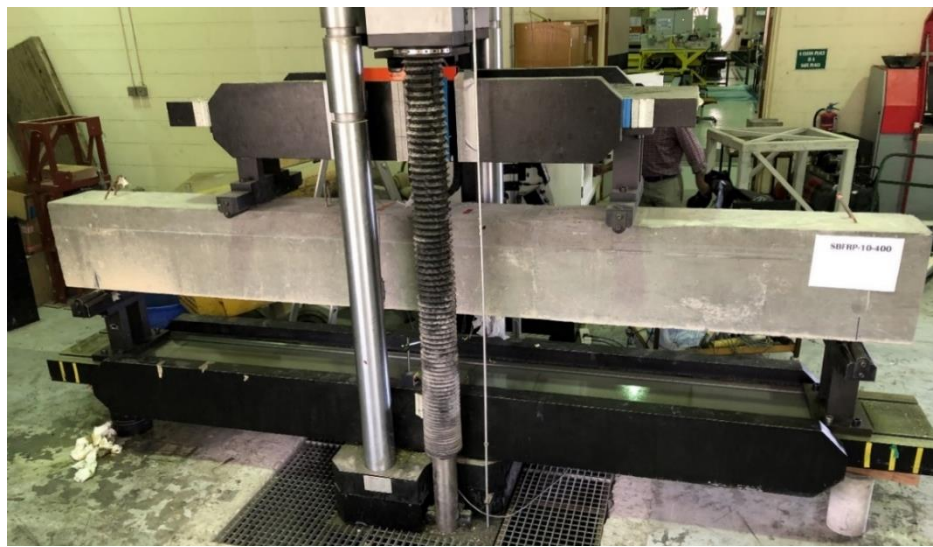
Beam 1 (SBFRP-10-400) testing setup
